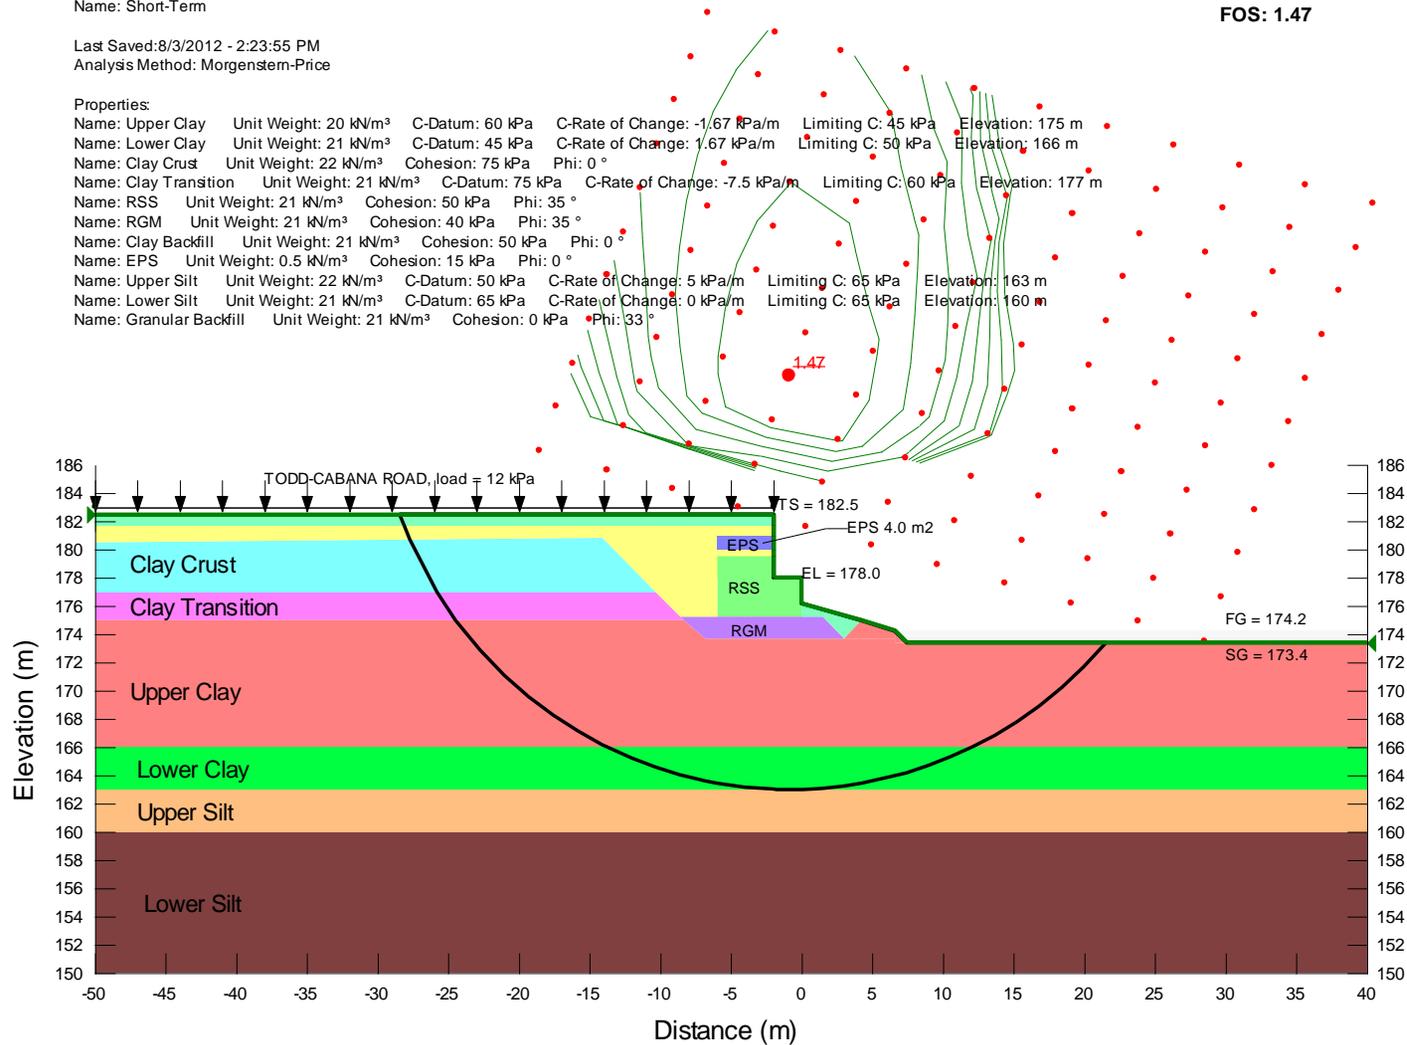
Global Stability Result – South Abutment (10+100) – End of Construction (Undrained) Loading
